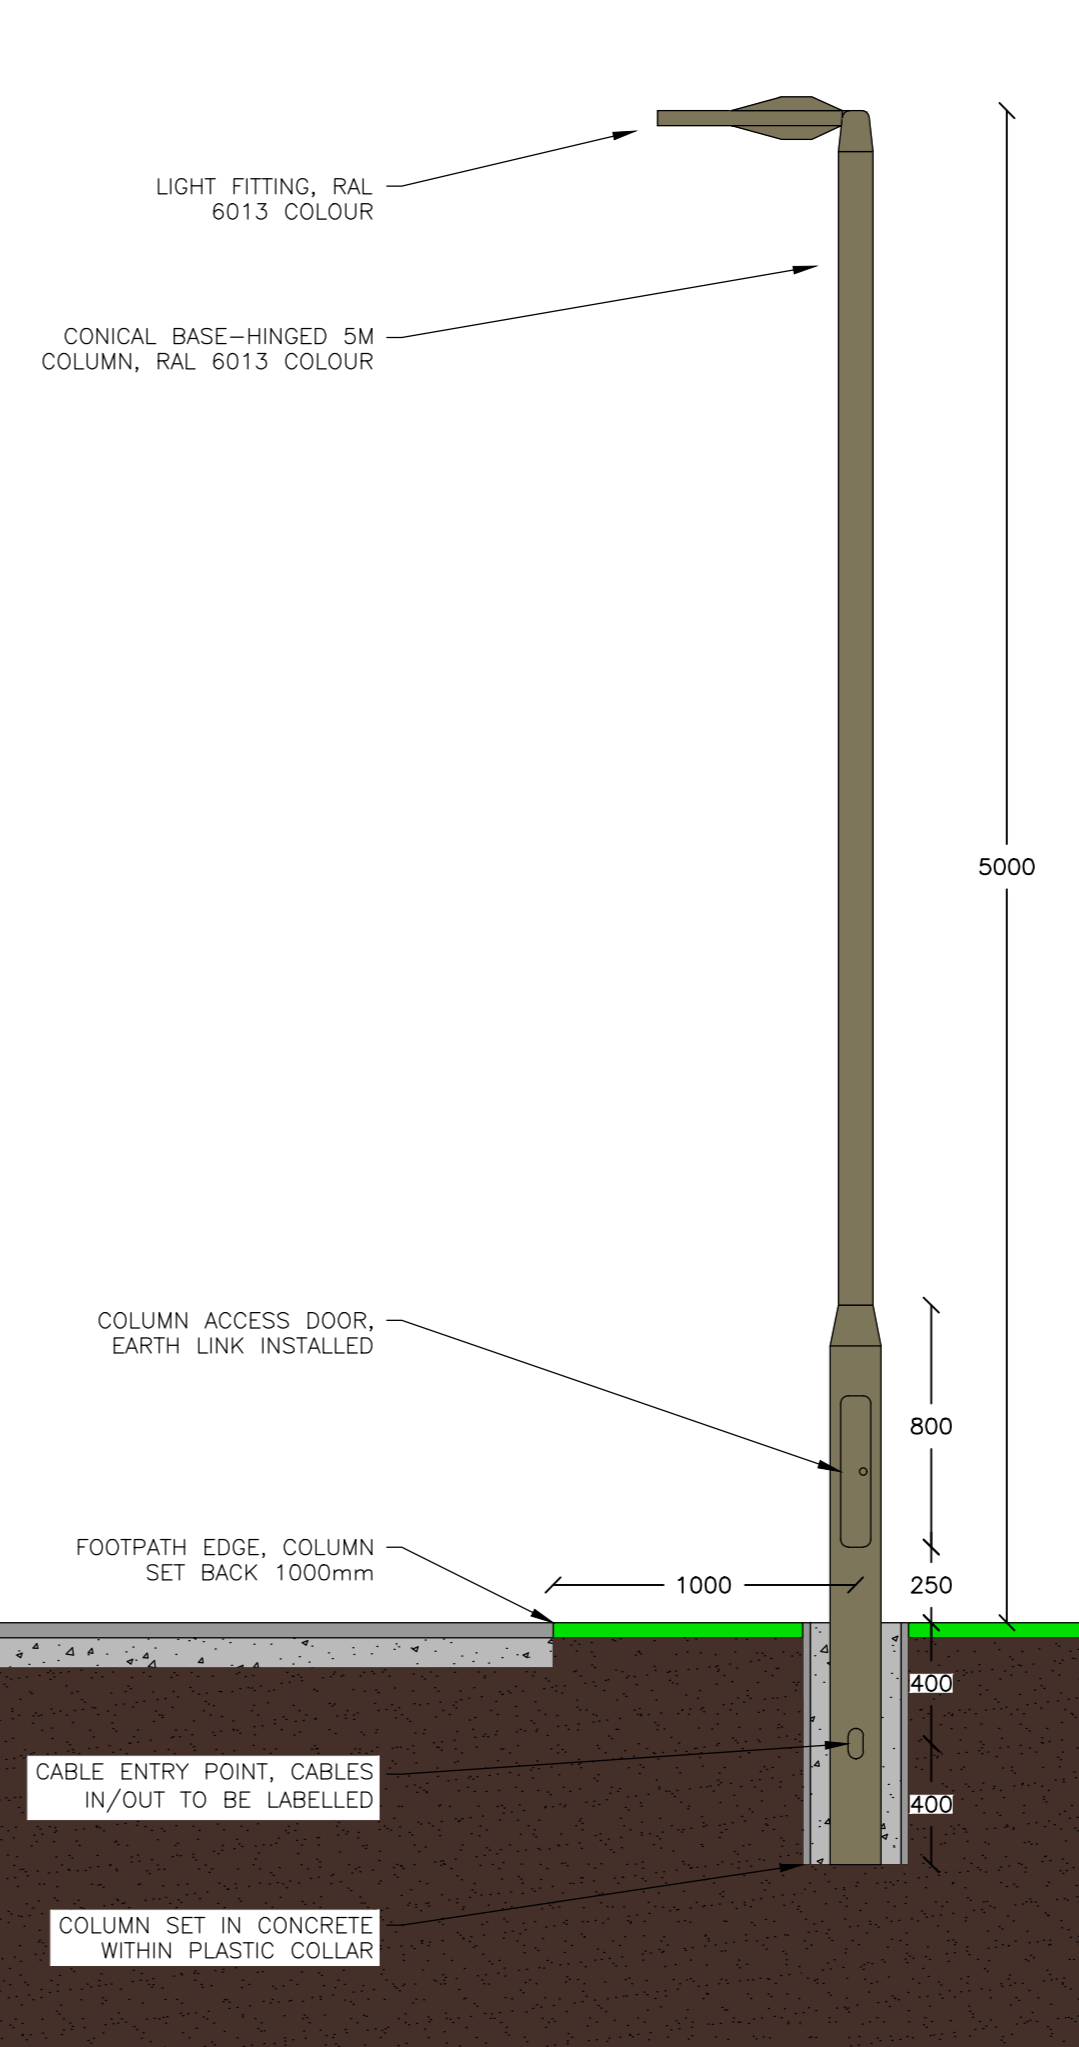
COLUMN, SCALE 1:25
